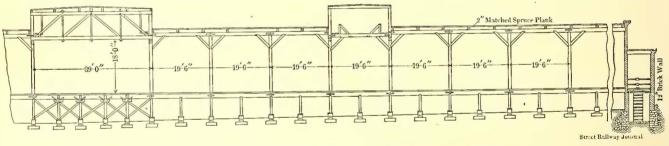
HALF LONGITUDINAL SECTION OF NEW CAR HOUSE-BOSTON.
